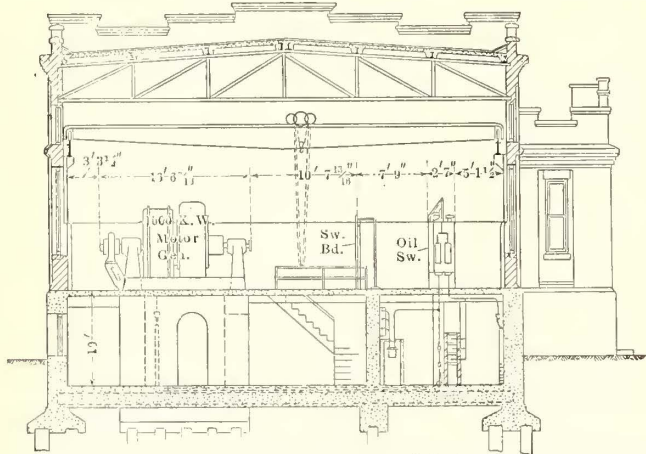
Detroit Tunnel—Cross-Section of Substation Along Line F-F Shown on Plan
